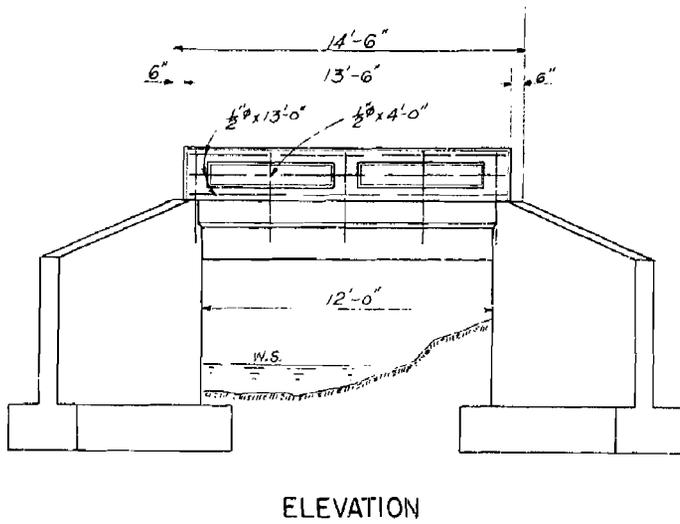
Bridge 447 Additions, Construction Details (Delaware State Highway Department 1948)
